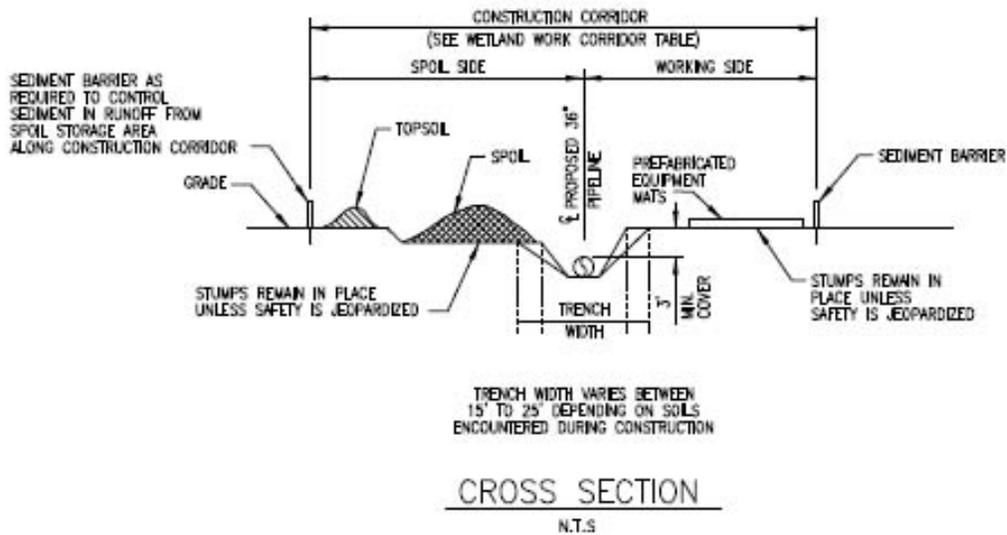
Construction detail for "flooded wetland" pipeline installation.
